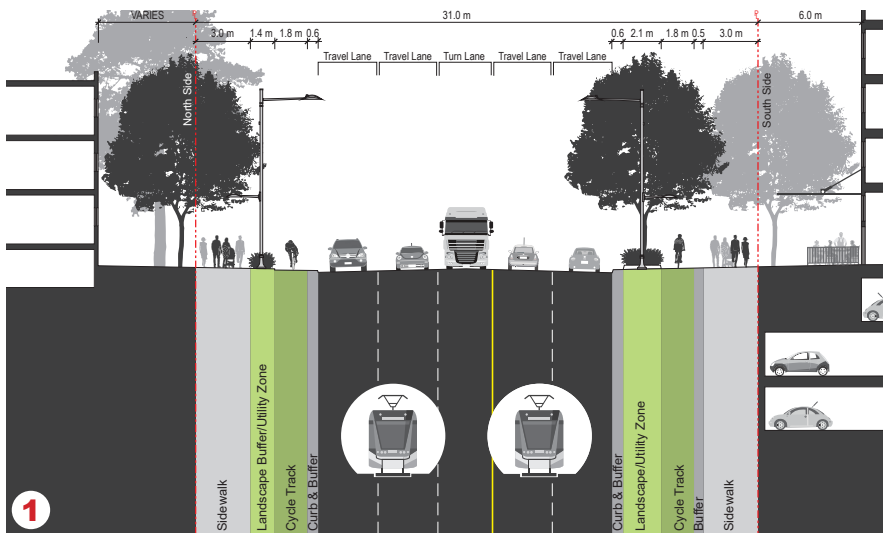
Proposed street right-of-way cross-section - Eglinton Avenue E.
